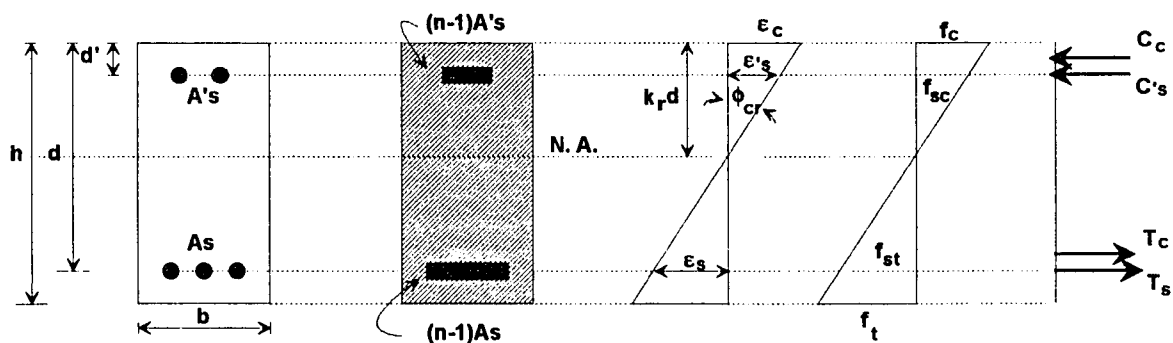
Reinforced concrete beam section at cracking stage
